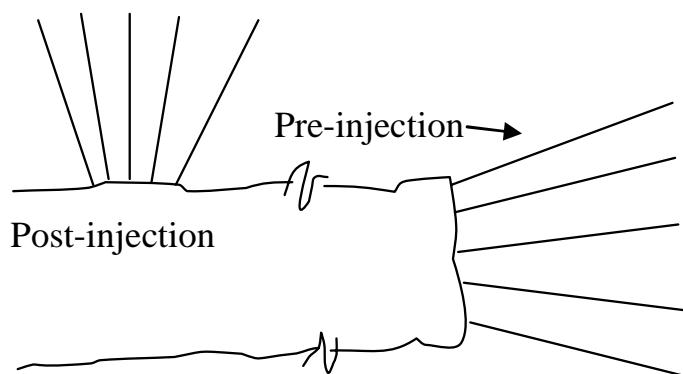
Pre-excavation grouting and post-grouting in schematic tunnel plan view
